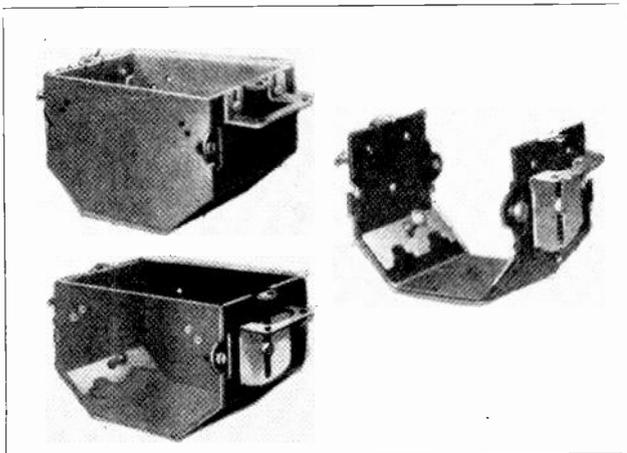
Several views of a sectional outlet box of the type used for mounting switches and receptacles.
